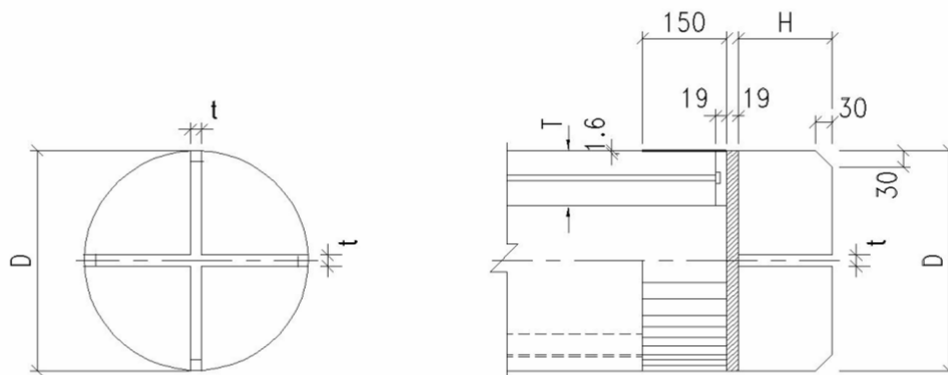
Pile Shoe Details for a Precast Prestressed Spun Concrete Pile
